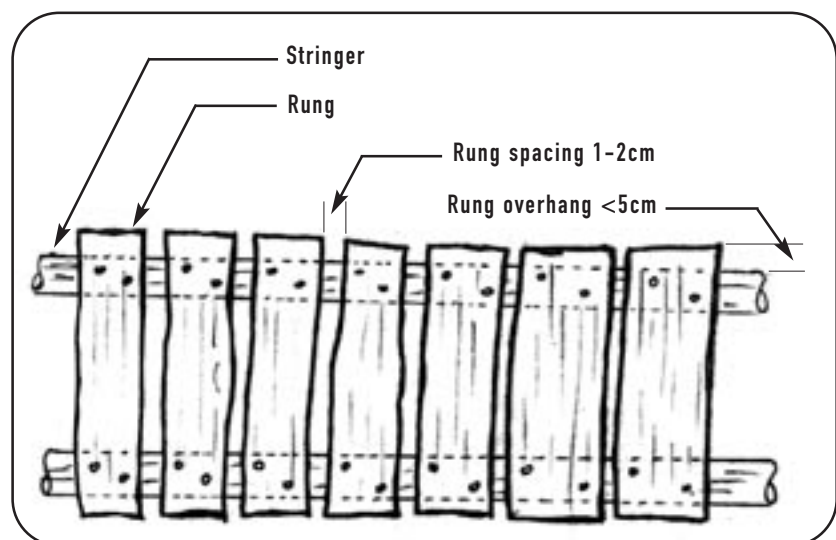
BRIDGE RUNG SPACING, RUNG OVERHANG
